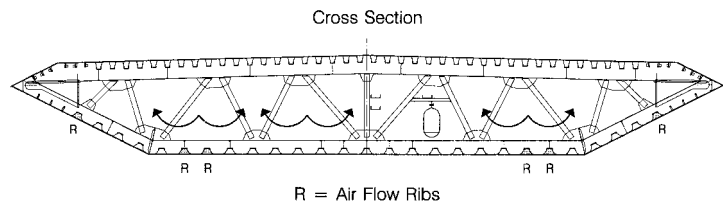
Dehumidification principle on a closed steel box girder, cross section
